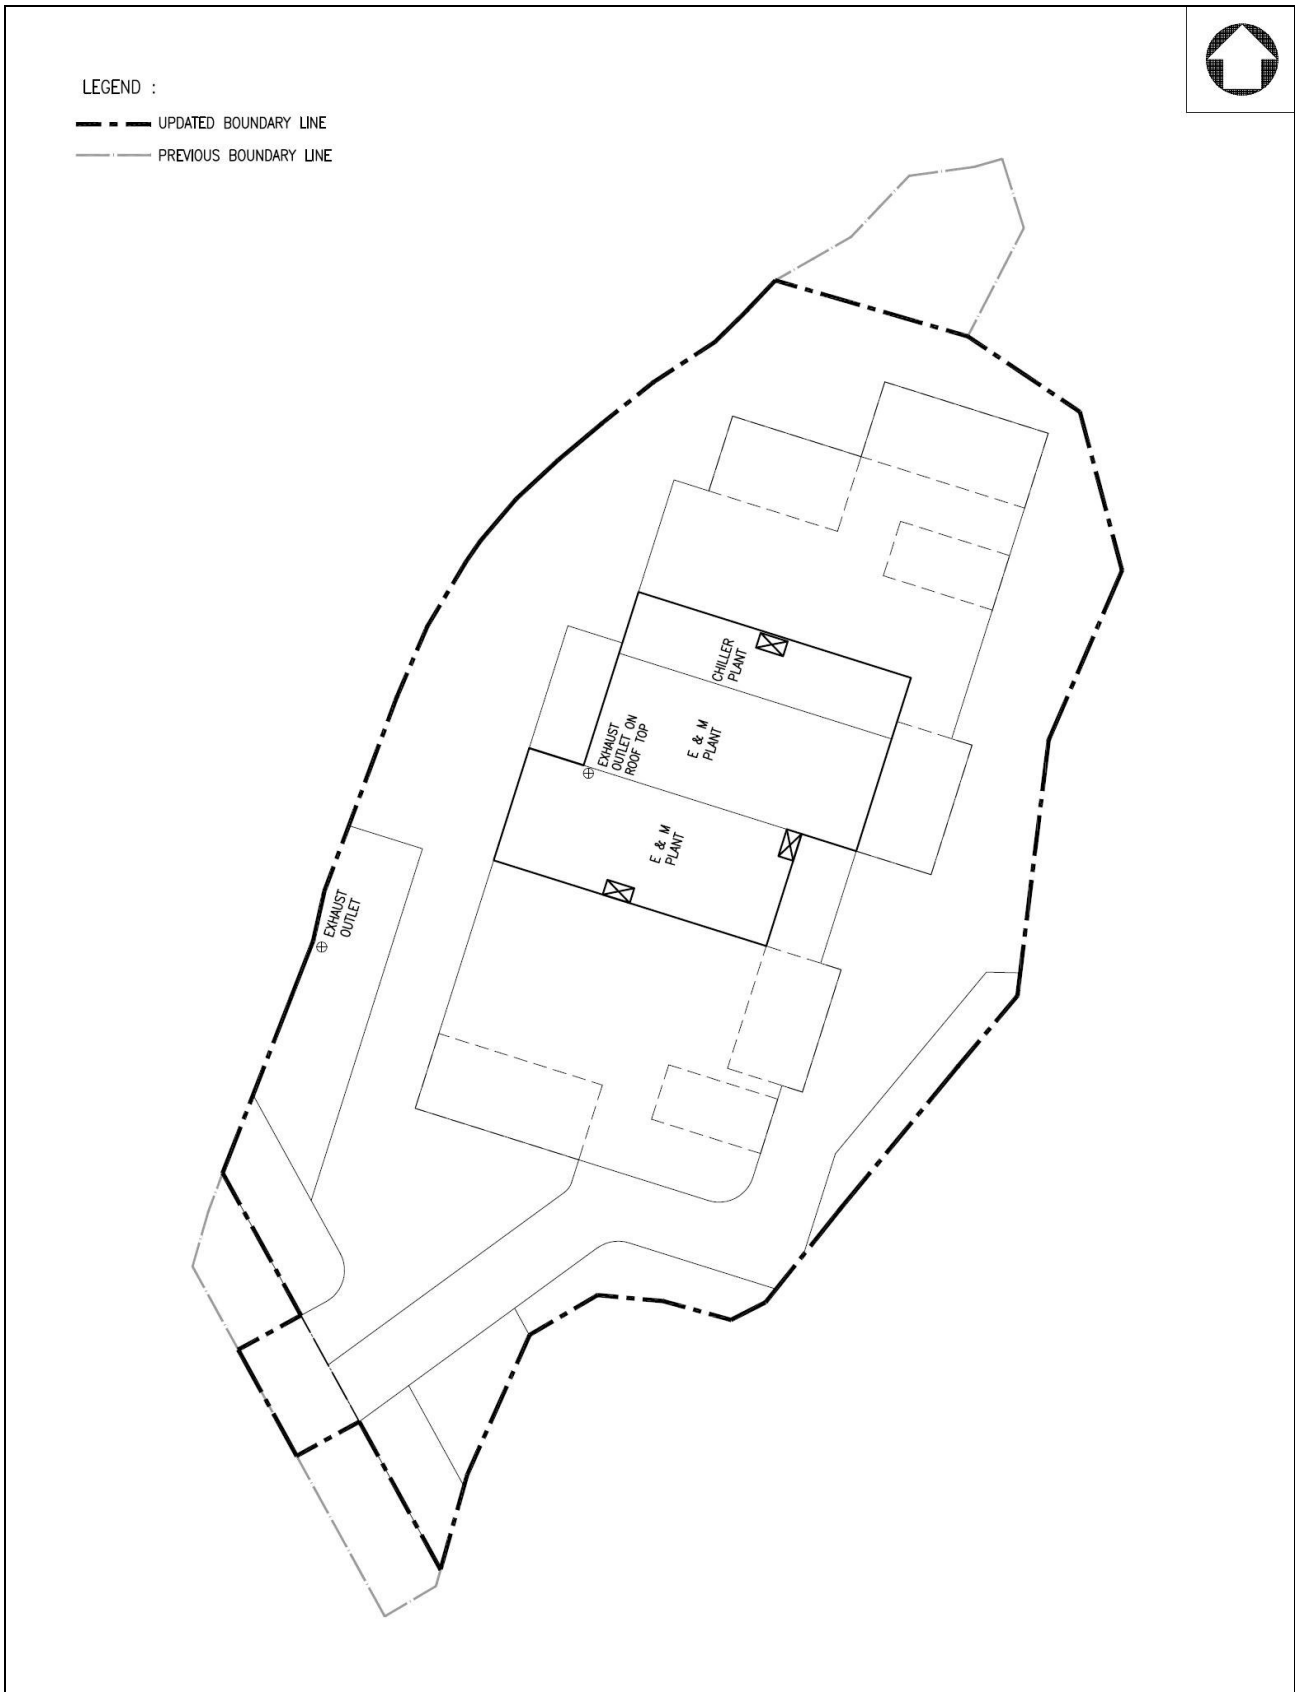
PSC Conceptual Design – 1/F Layout Plan
